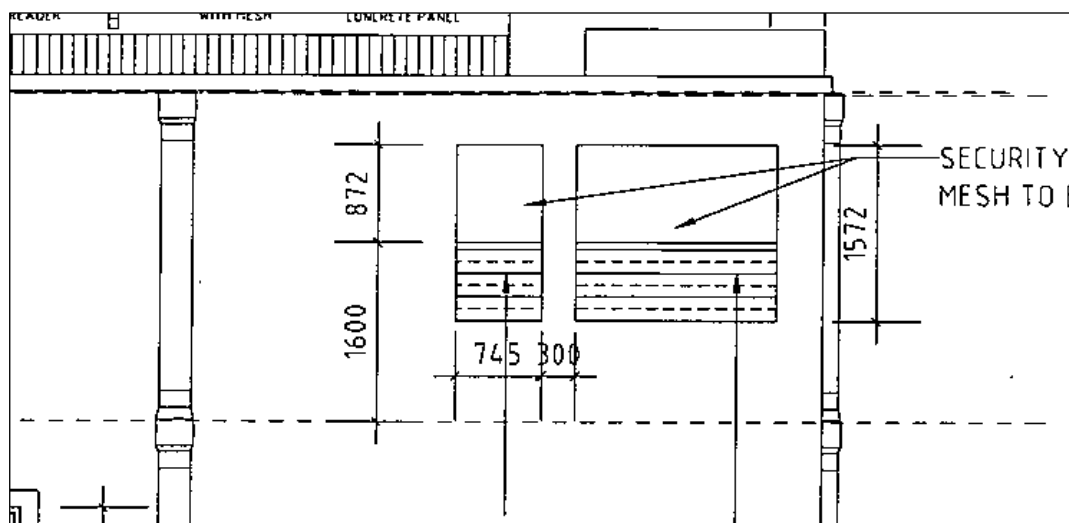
Thickness of Level 4 “Balcony” columns and upper / lower wall sections.
